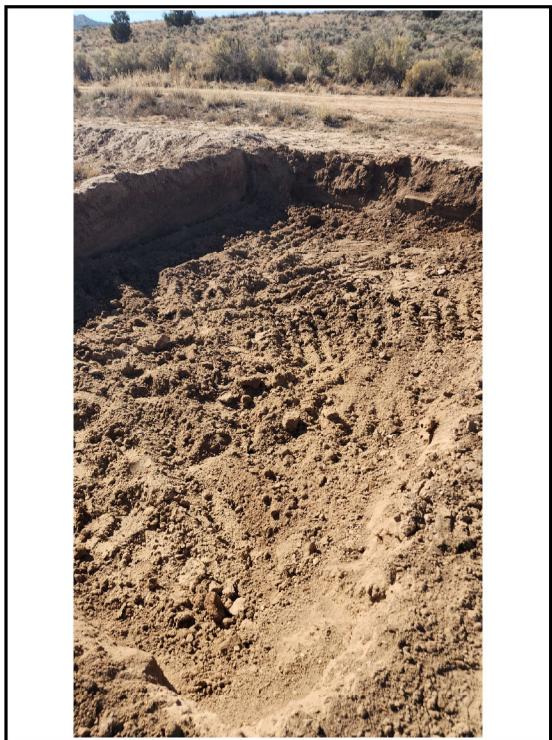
Final Excavation. Looking southwest with view of base, south, and west wall.
